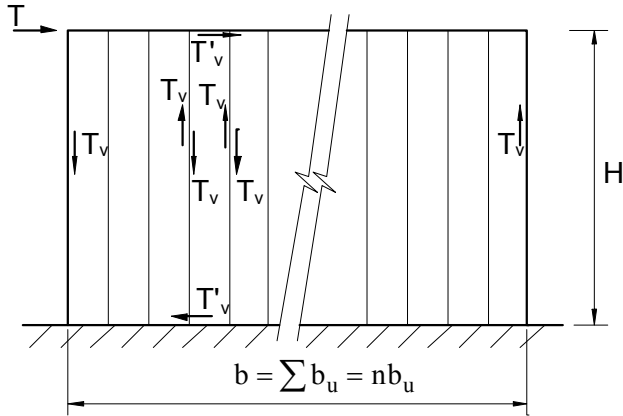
Diaphragm forces in cassette wall constructions (Davies, 2005)
